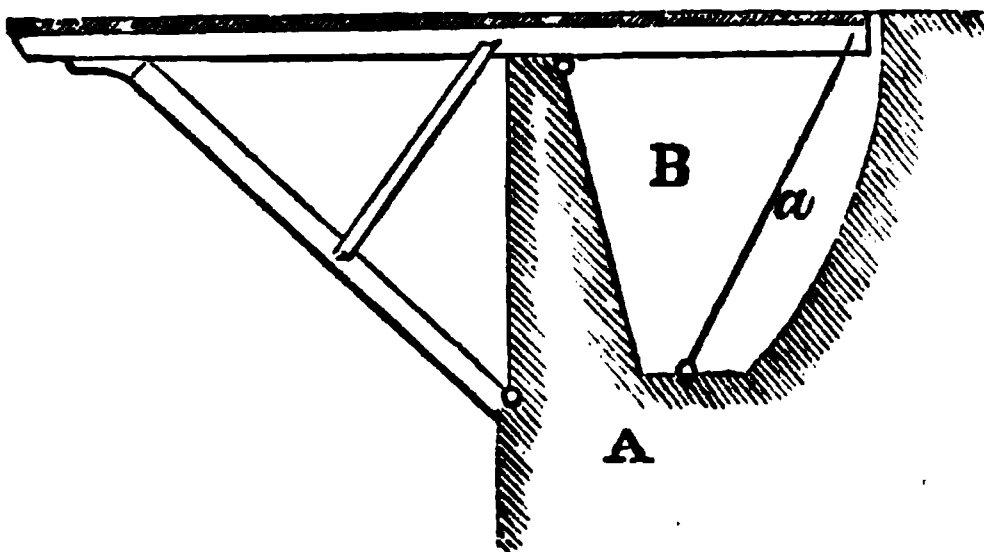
Shows the arrangement of a draw-bridge where the counterpoise is formed by prolonging back the platform.
